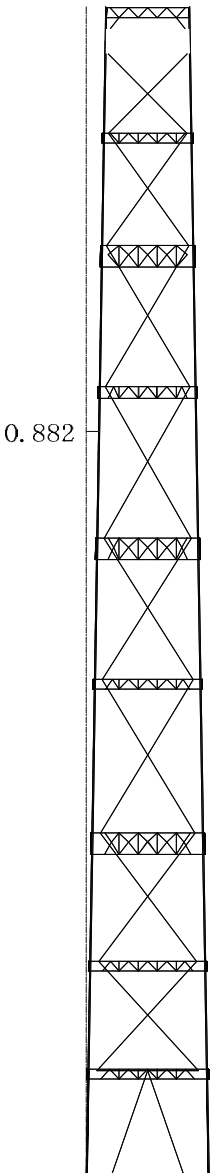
Elevation of outer frame of Goldin Finance 117 Tower (Source: ECADI)
